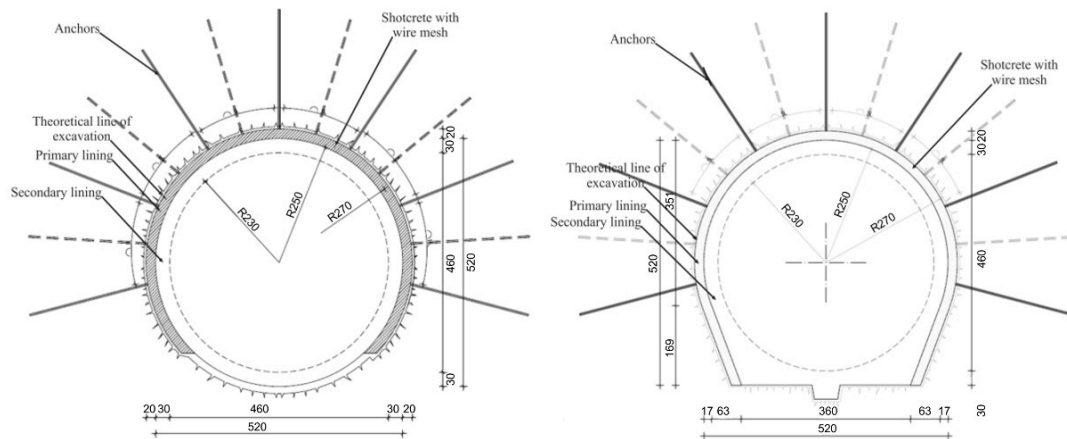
Initial TBM (round shape) and changed NATM tunnel cross-section of implemented tunnel support type.
